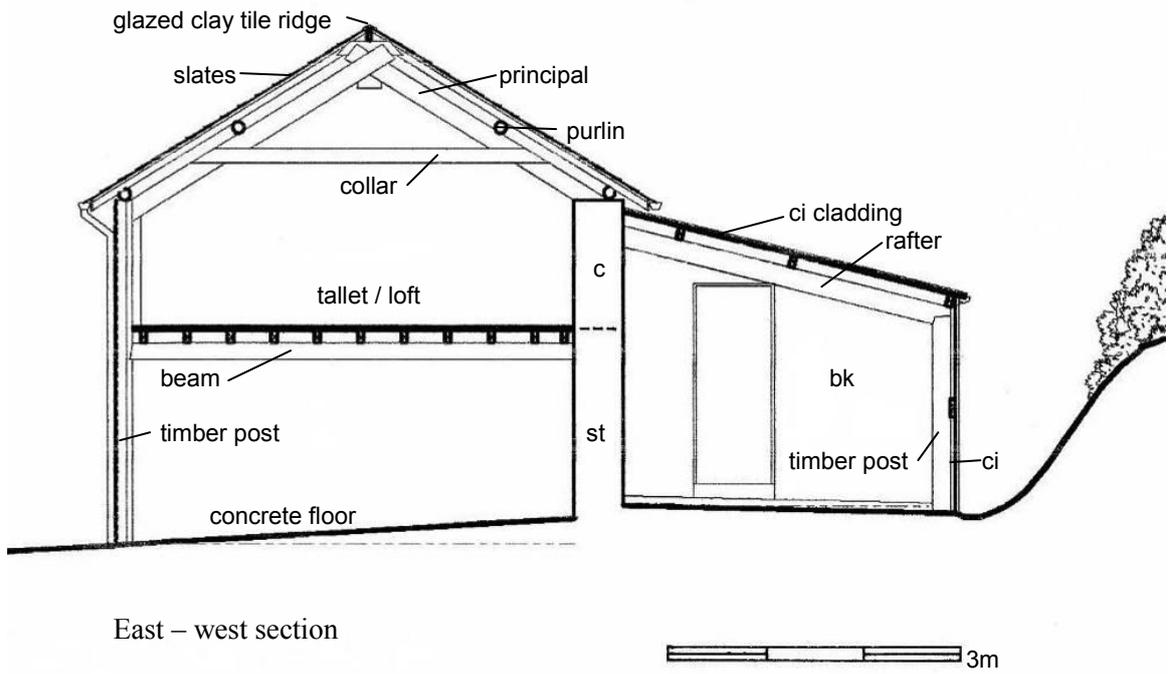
Woodhayes, Clyst Hydon. Section through linhay west range and lean-to
